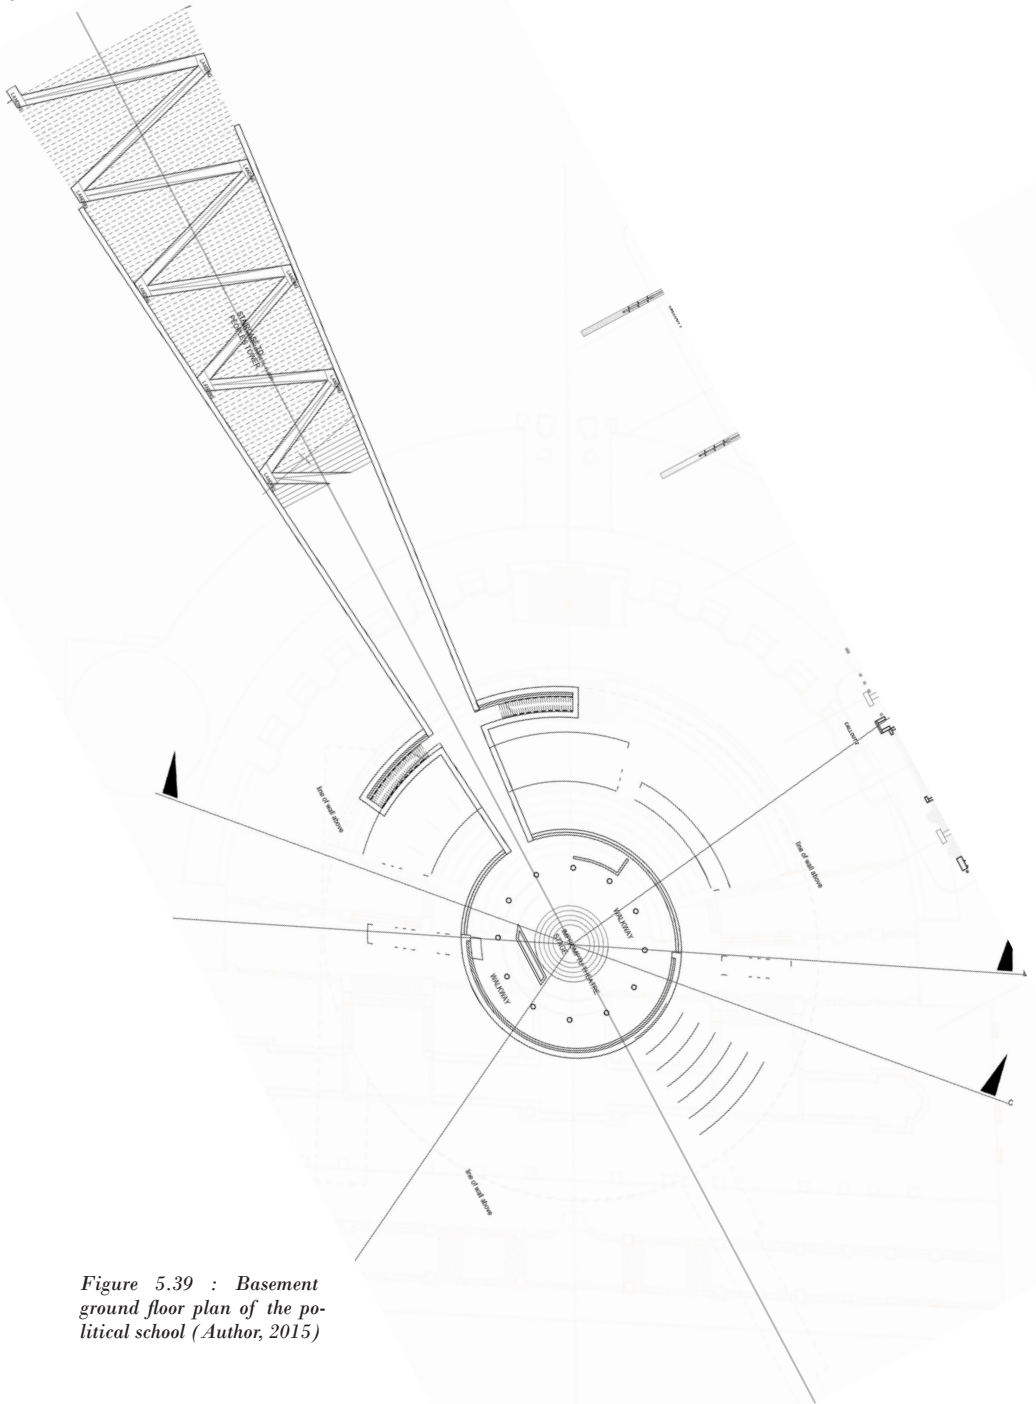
Basement ground floor plan of the political school (Author, 2015)
